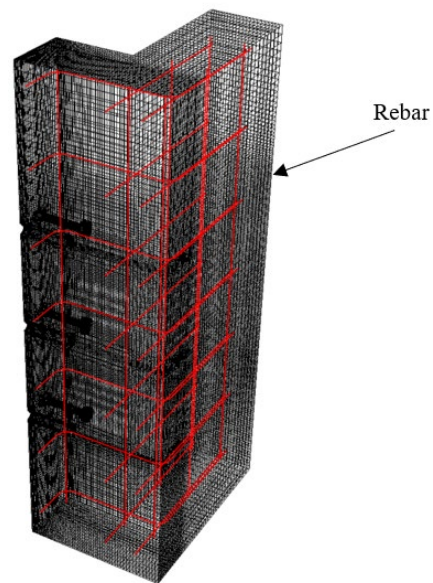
Rebar Inside Haunch and Slab
